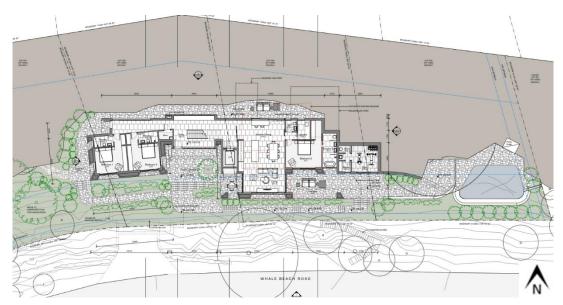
Proposed Ground Floor plan, Extract from Ground Floor Plan (Source: Drawing No. 1102, Rev. A)
